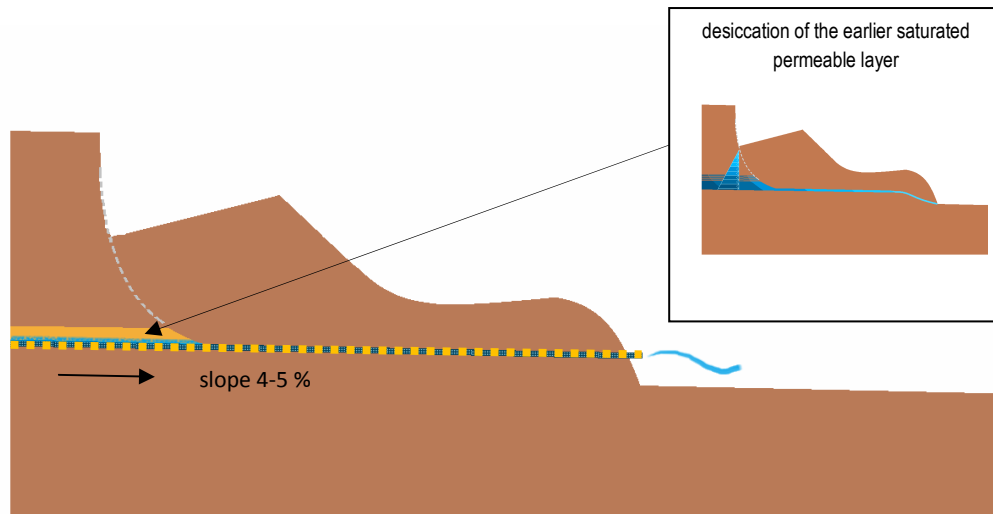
Sketch of an embankment cross section showing the drilled drainage system in action
